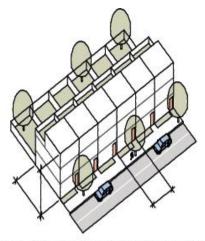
Town house - adding a storey to the typical terrace typology (Allies and Morrison sketch)
